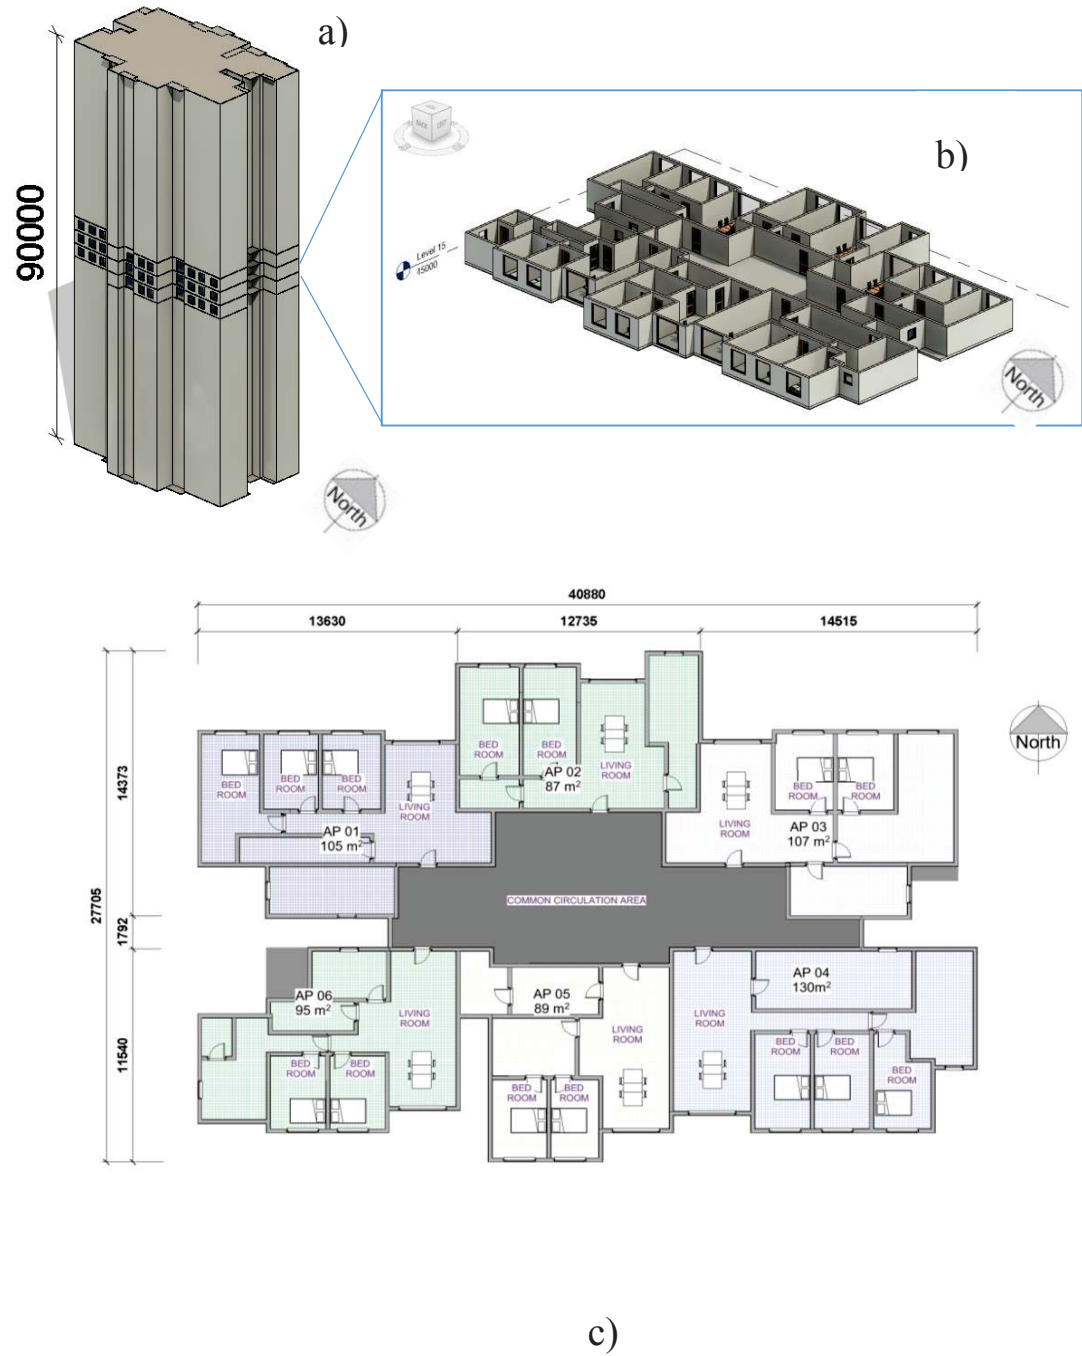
a) 3D view of the BIM model, b) 3D view of a typical floor, c) detailed plan view of a typical floor (All dimensions are in millimeters).
